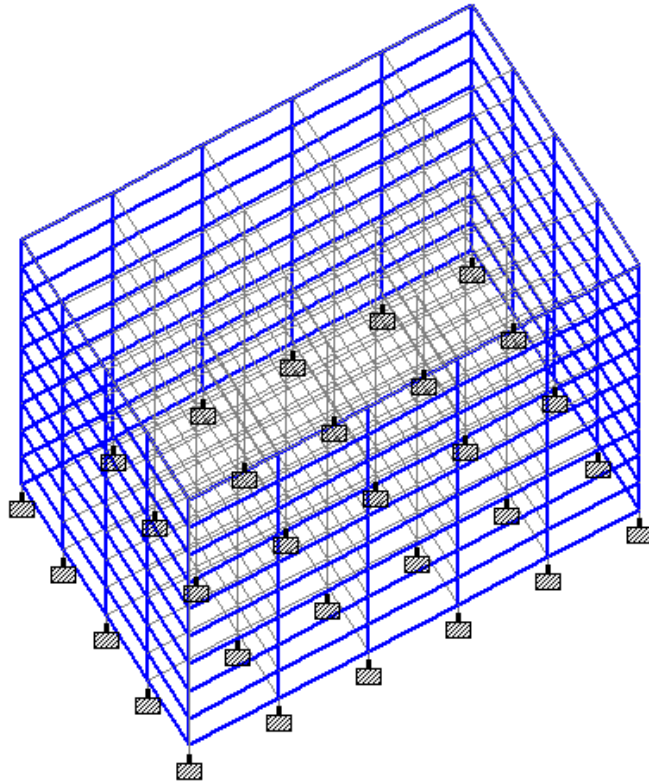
Model 8.3: Masonry infill as surface element – 3D View
